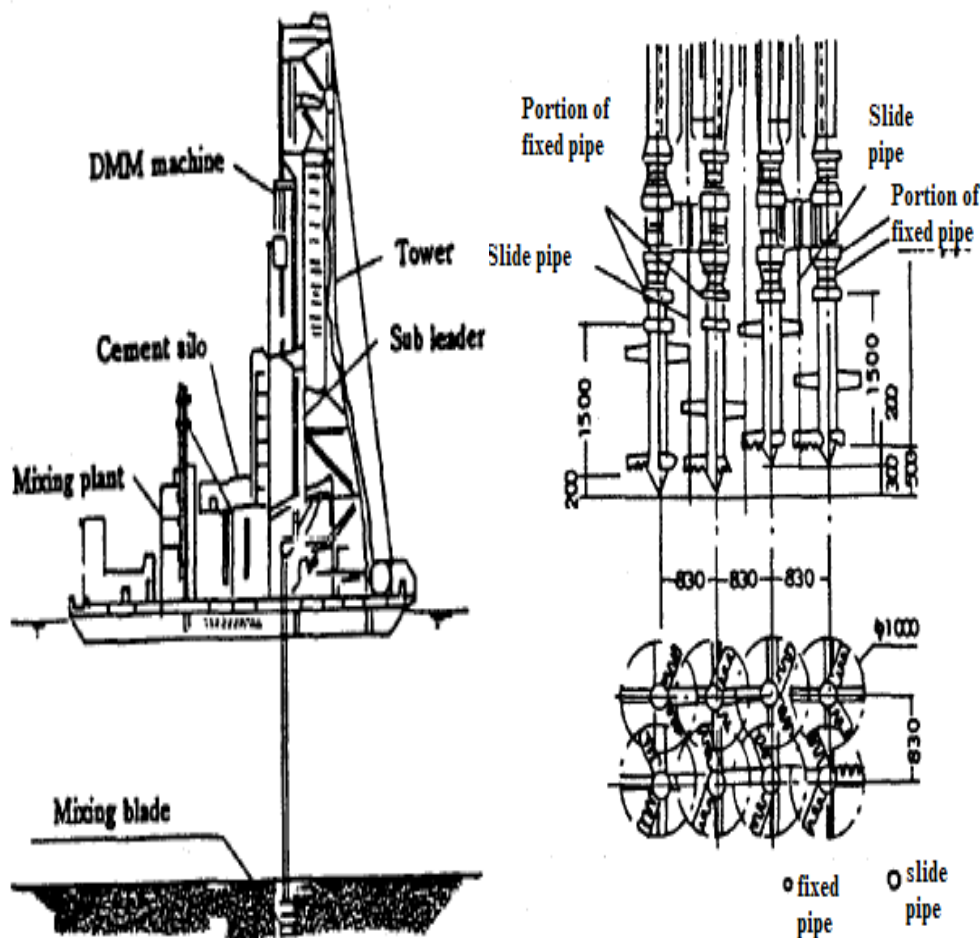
Elevation of deep soil mixing work and details of mixing equipment (Unami et al., "Deep Mixing Method at Ukishima Site of the Trans-Tokyo Bay Highway Project", pp. 777-782, 1996).
